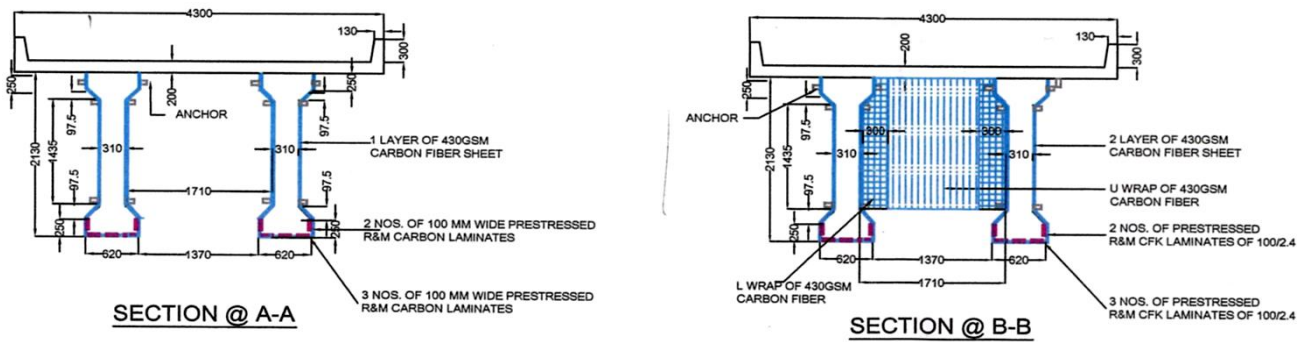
Sectional elevation of Ratlam railway bridge PSC I girders
